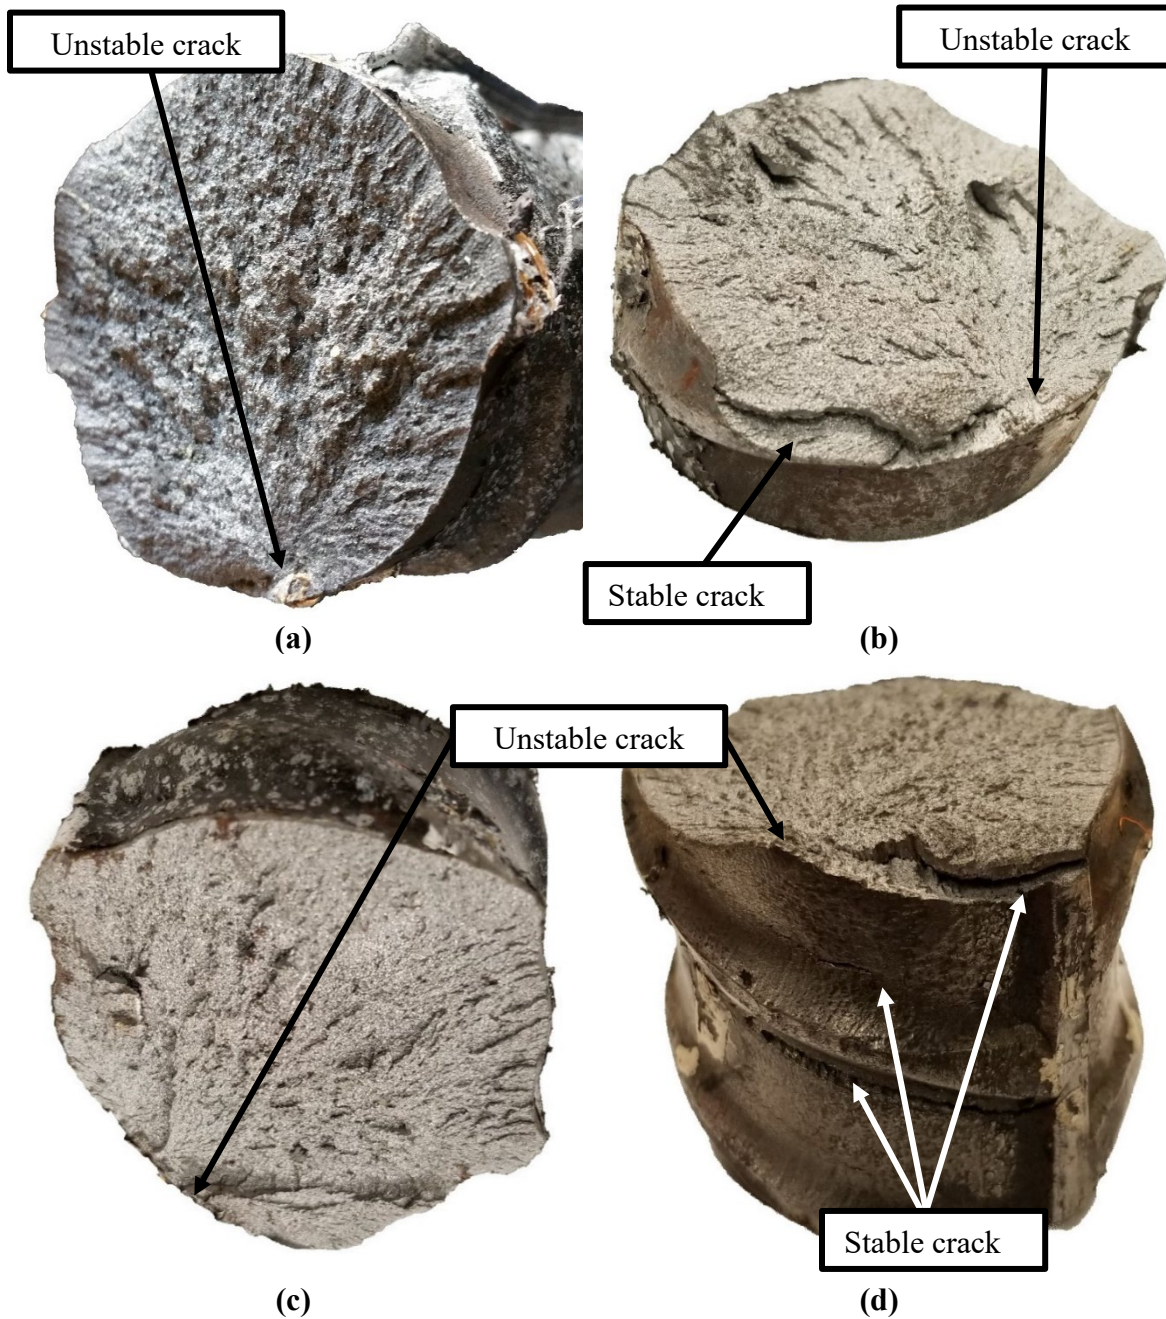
Fracture surfaces due to Plastic Buckling-Straightening Fatigue:
